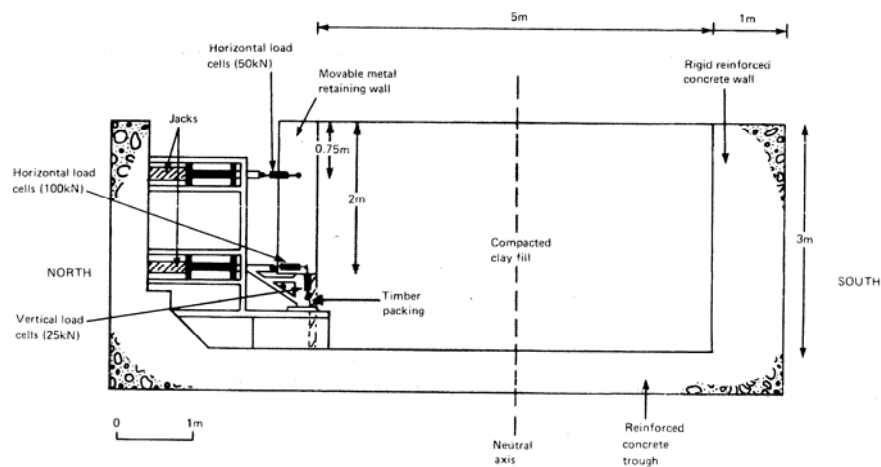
Experimental Retaining Wall (from: Clayton et al., 1991)
